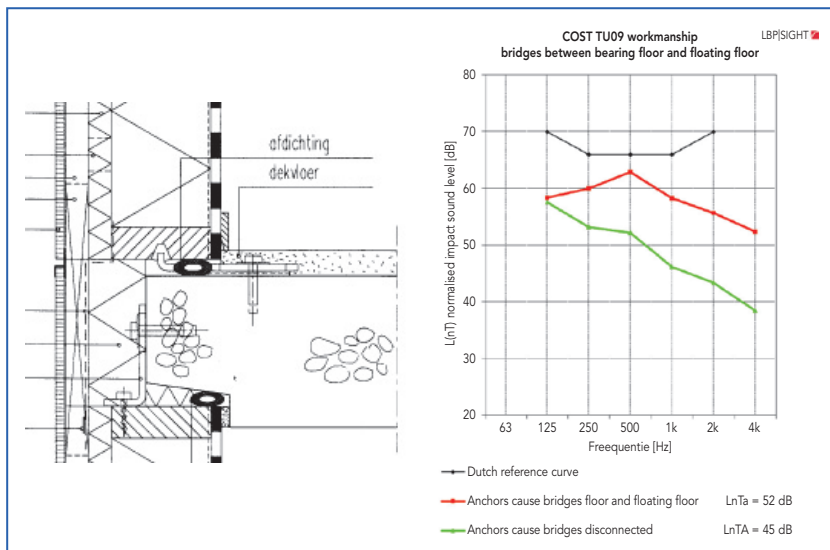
Left: Anchors to fasten TBB inner facades cause connections between base floor and floating floor. The effect causes 7 dB higher L_{nTa} (red line before and green line after repair).
